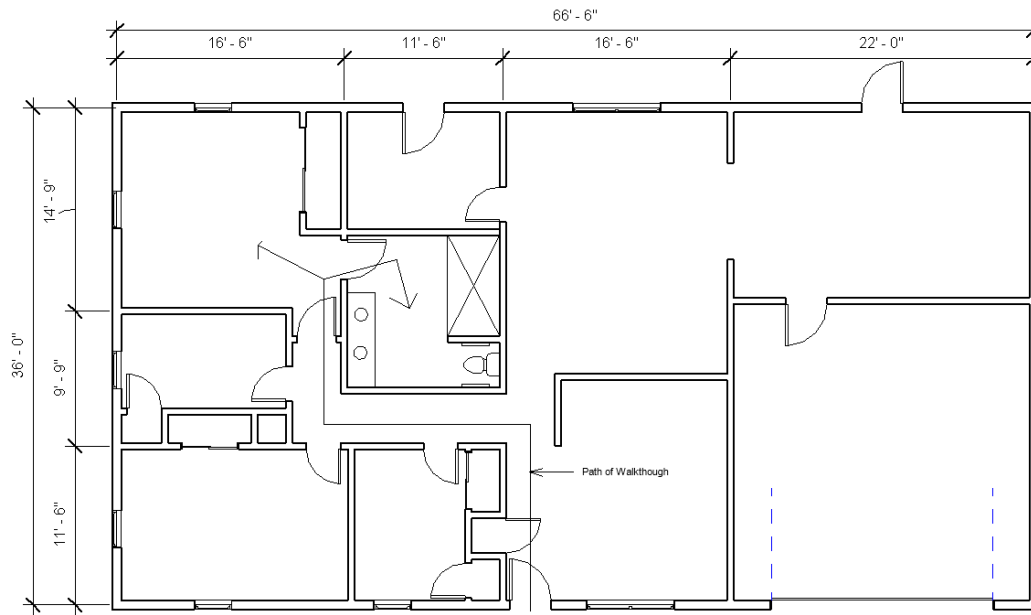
Floor Plan Showing the Intended Path of the Walkthrough
